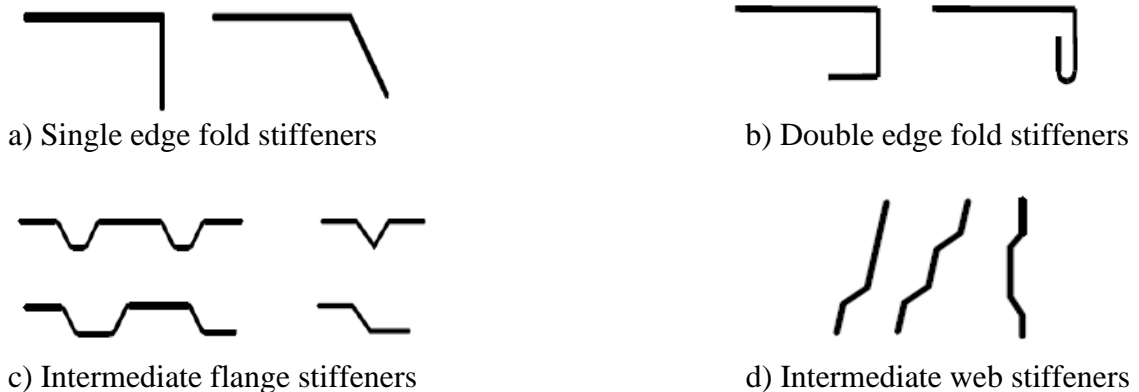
Typical forms of stiffeners for cold-formed members and sheeting [25].
